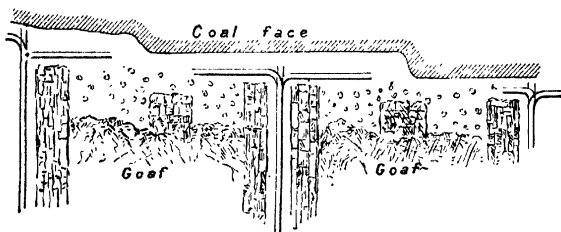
STONE PILLARING AND TIMBERING AT LONGWALL FACE.
